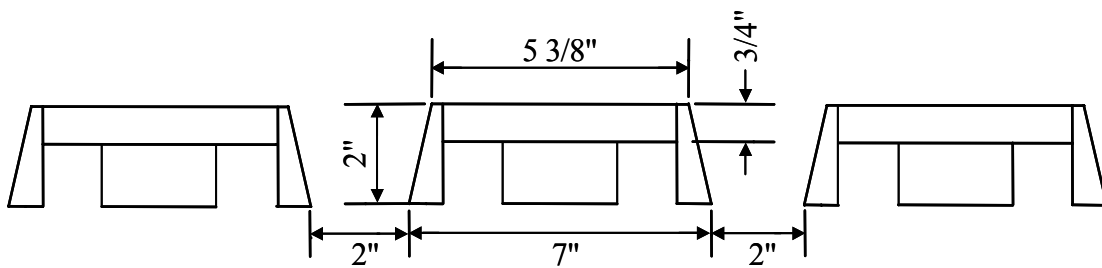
Constructed Cross Sectional View of the Deck Pan's Shape
